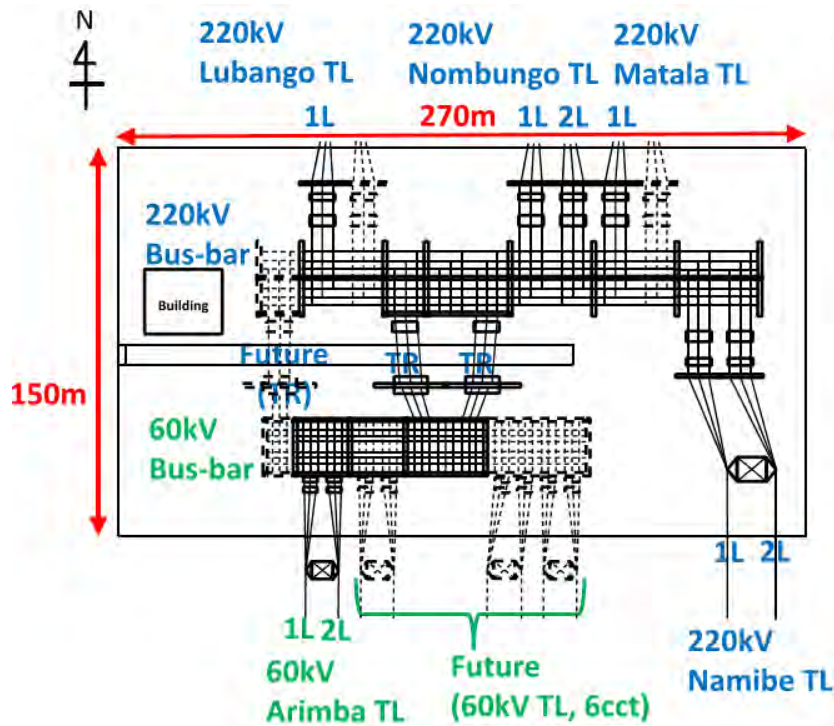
Layout of East Lubango substation and specification. Source: JICA, 2021.
